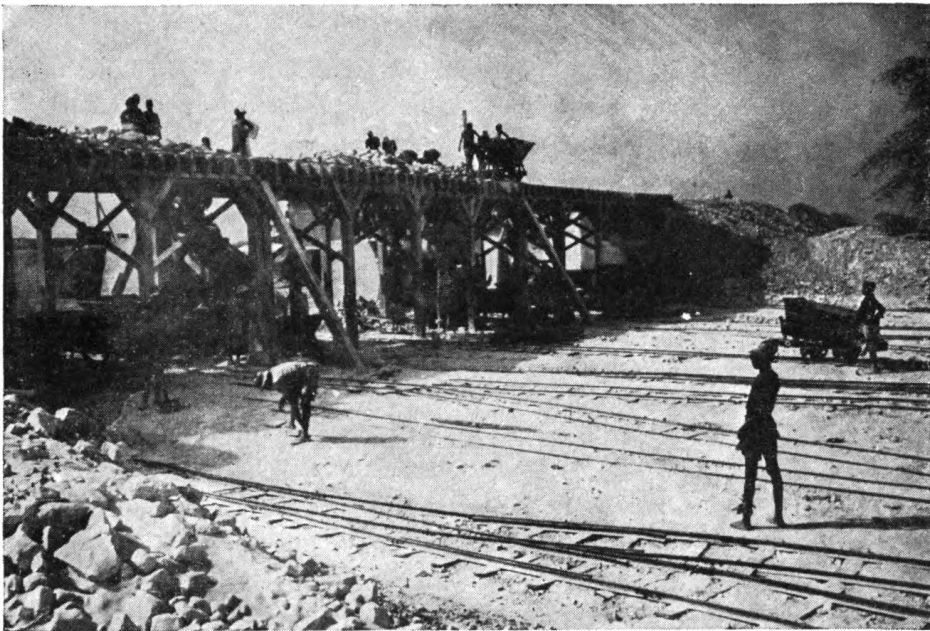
Existing quarry and crushing plant used in airdrome construction.
